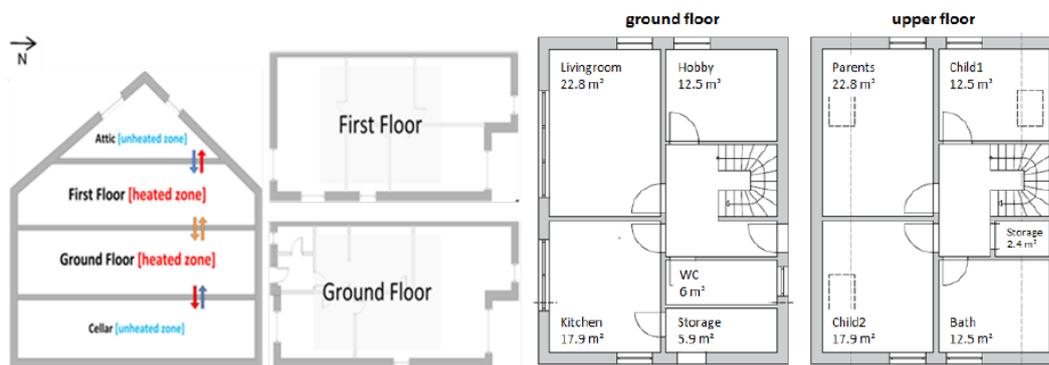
A schematic drawing & floor plan of the selected One Family Dwelling in Aixlib.
